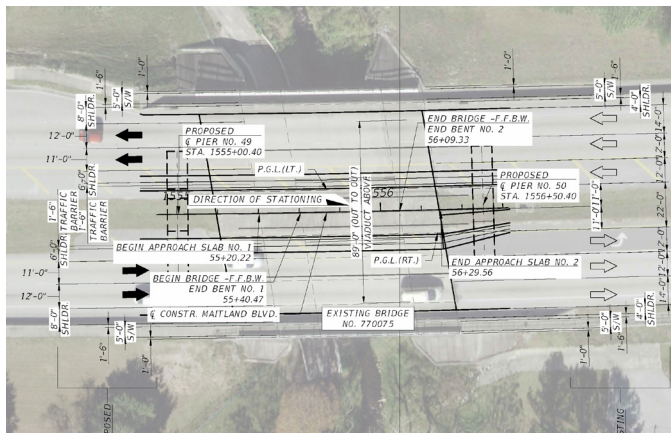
SR 414 Over Little Wekiva River Bridge (Plan View)
